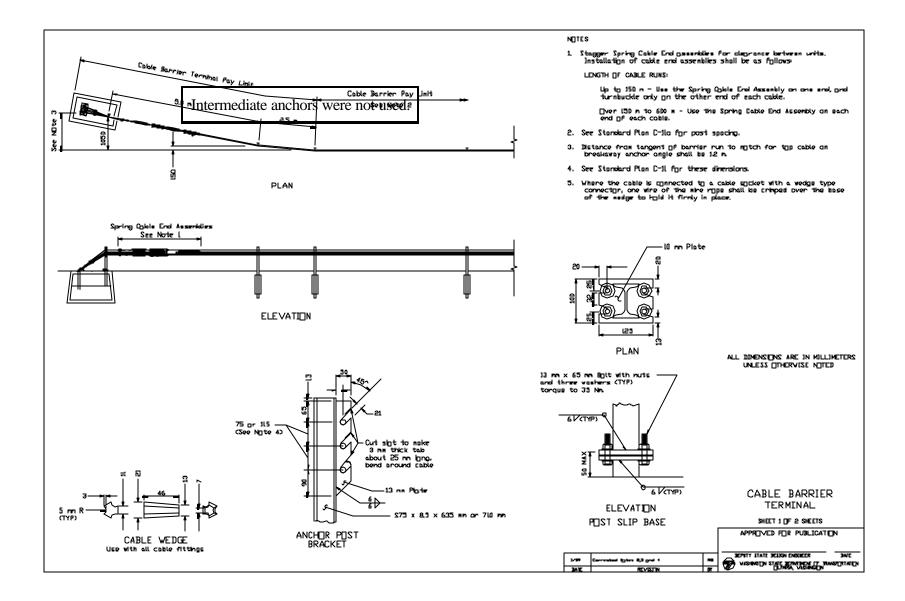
Details of the Washington 3-strand cable barrier for test 404211-8 (continued).
